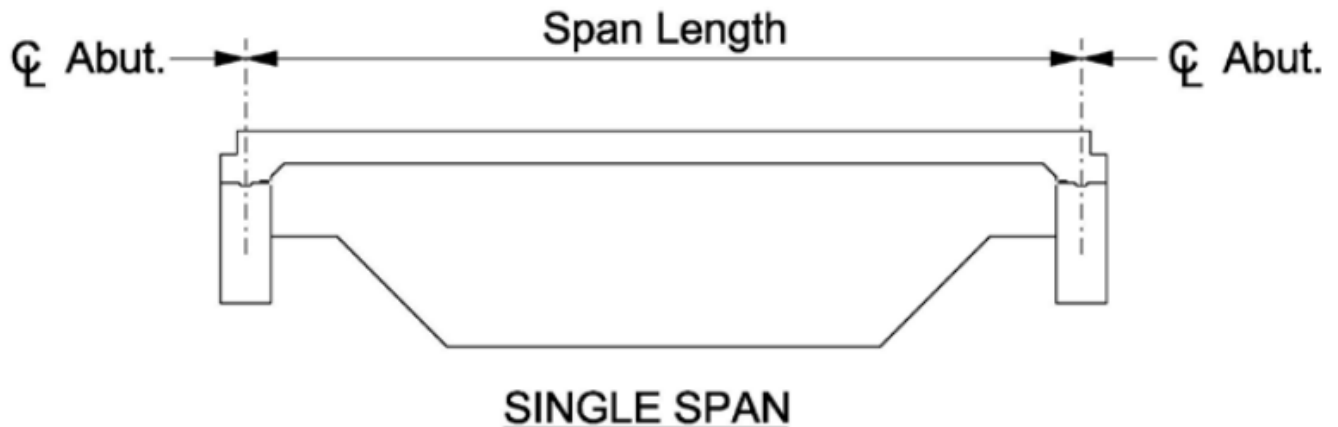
Single-span slab bridge (adapted from Wisconsin DOT 2015).
